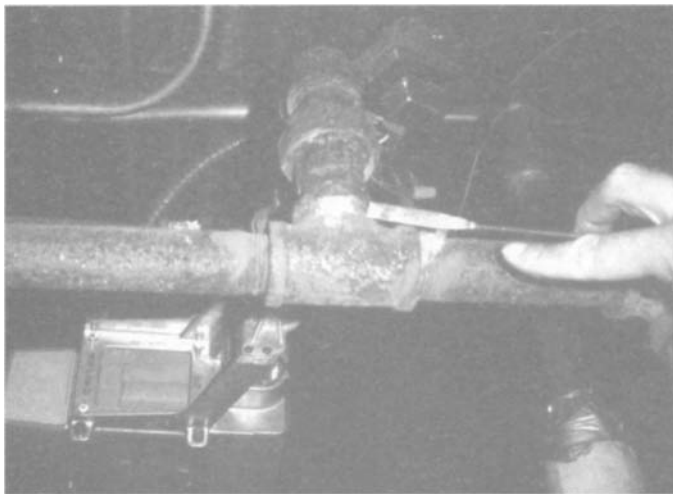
Laboratory spatula used for dislodging residue from surfaces and components.
